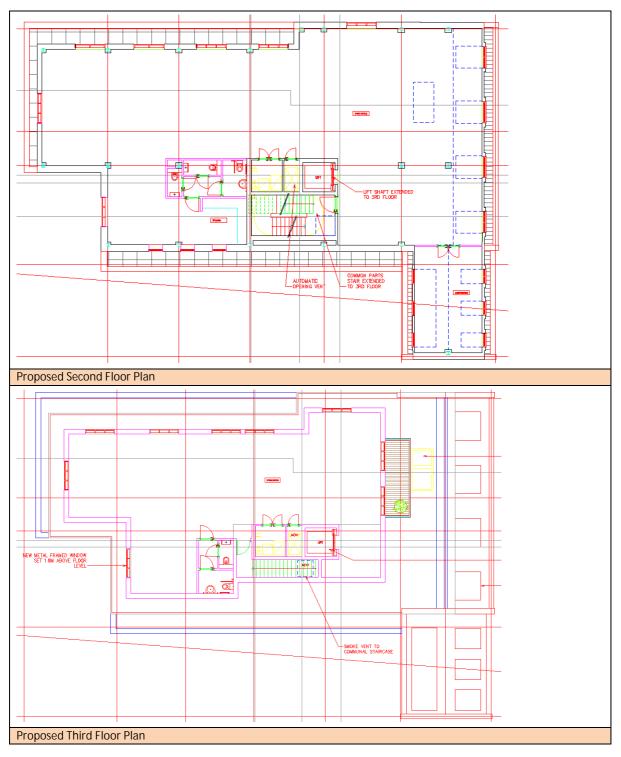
Second and third floor plans for the proposed St George's Road office extension
